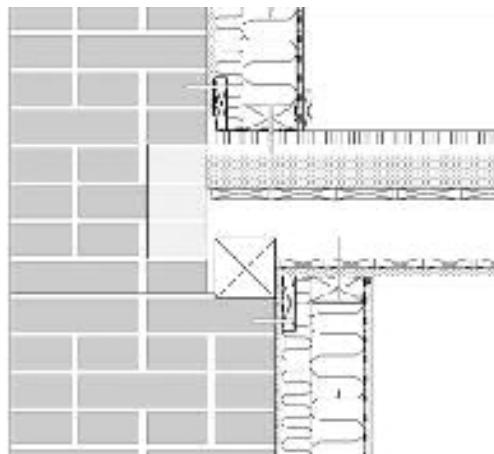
Vertical section of the joint between the loadbearing wall, which is the facade, and the horizontal partition after improved thermal insulation measures.
